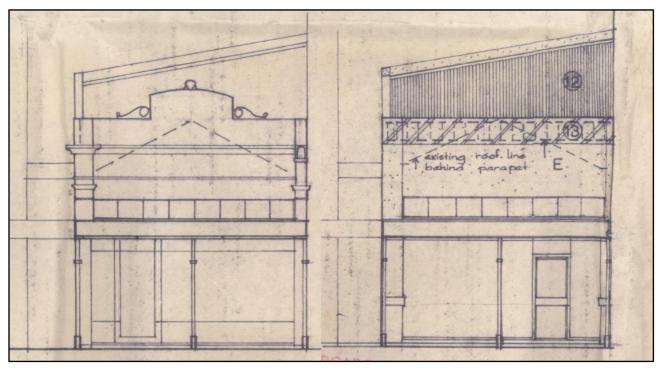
Detail from 1964 plan, showing the original and planned alterations to the west elevation of the building at 7 Dee Street (E R Garden & Associates, 1964).
